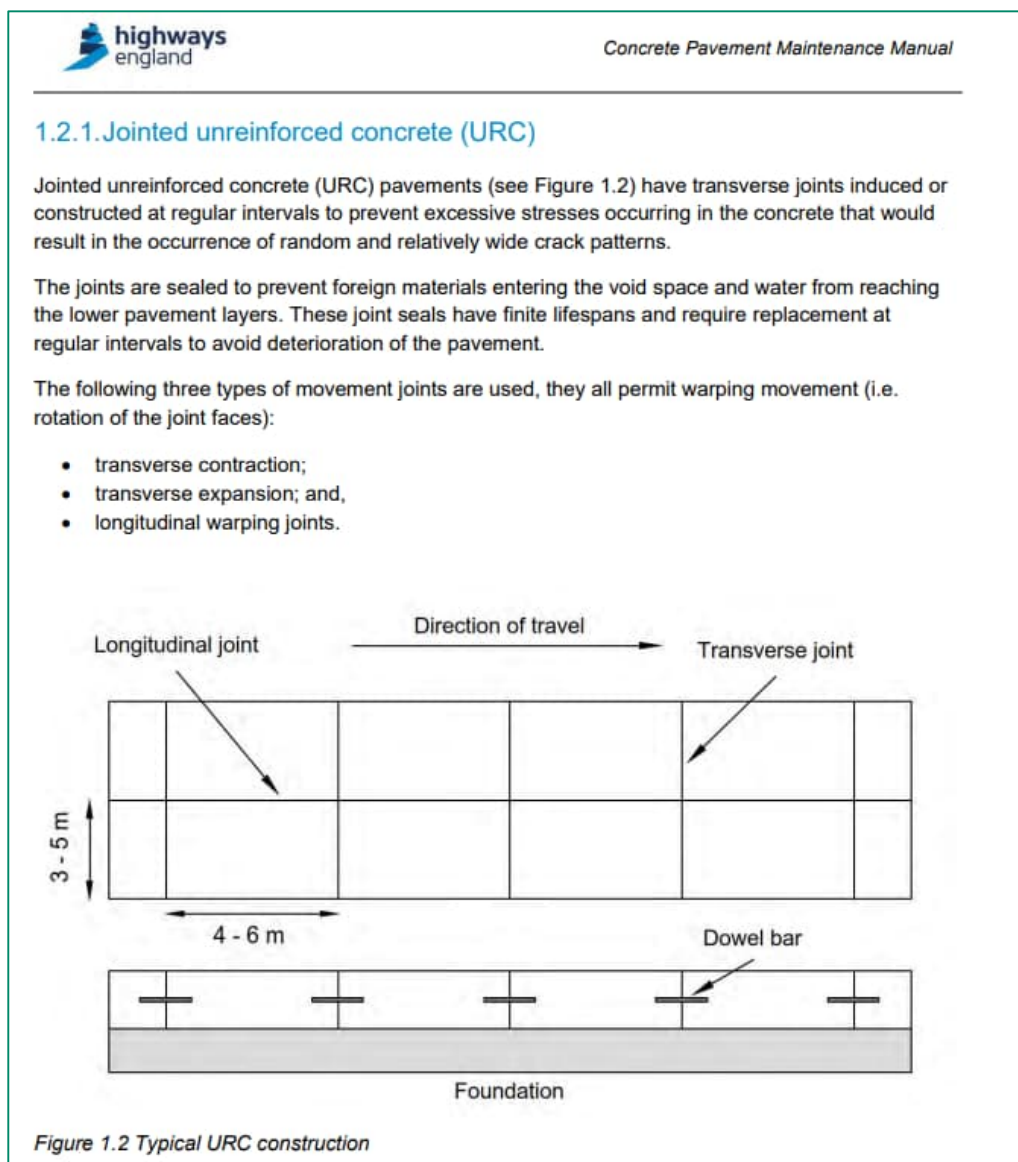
Typical Concrete Pavement (Source: HE - Concrete Pavement Maintenance Manual, June 2021)
